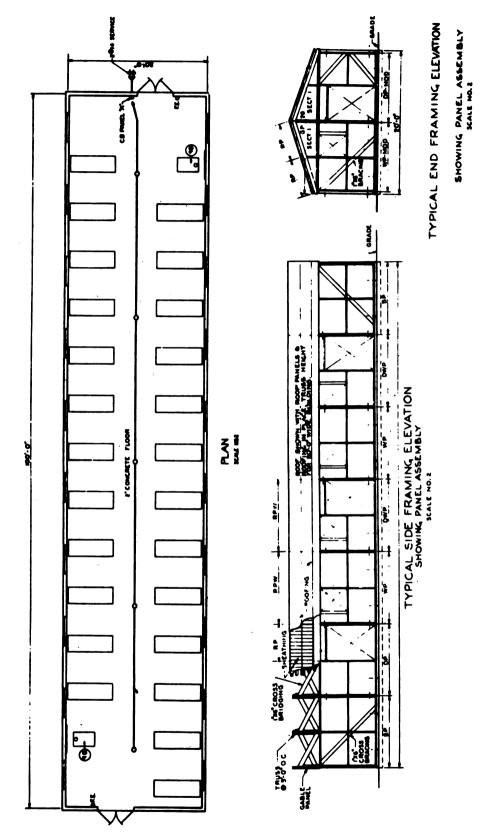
Construction druwing for 5t-mun burrucks—continued.
